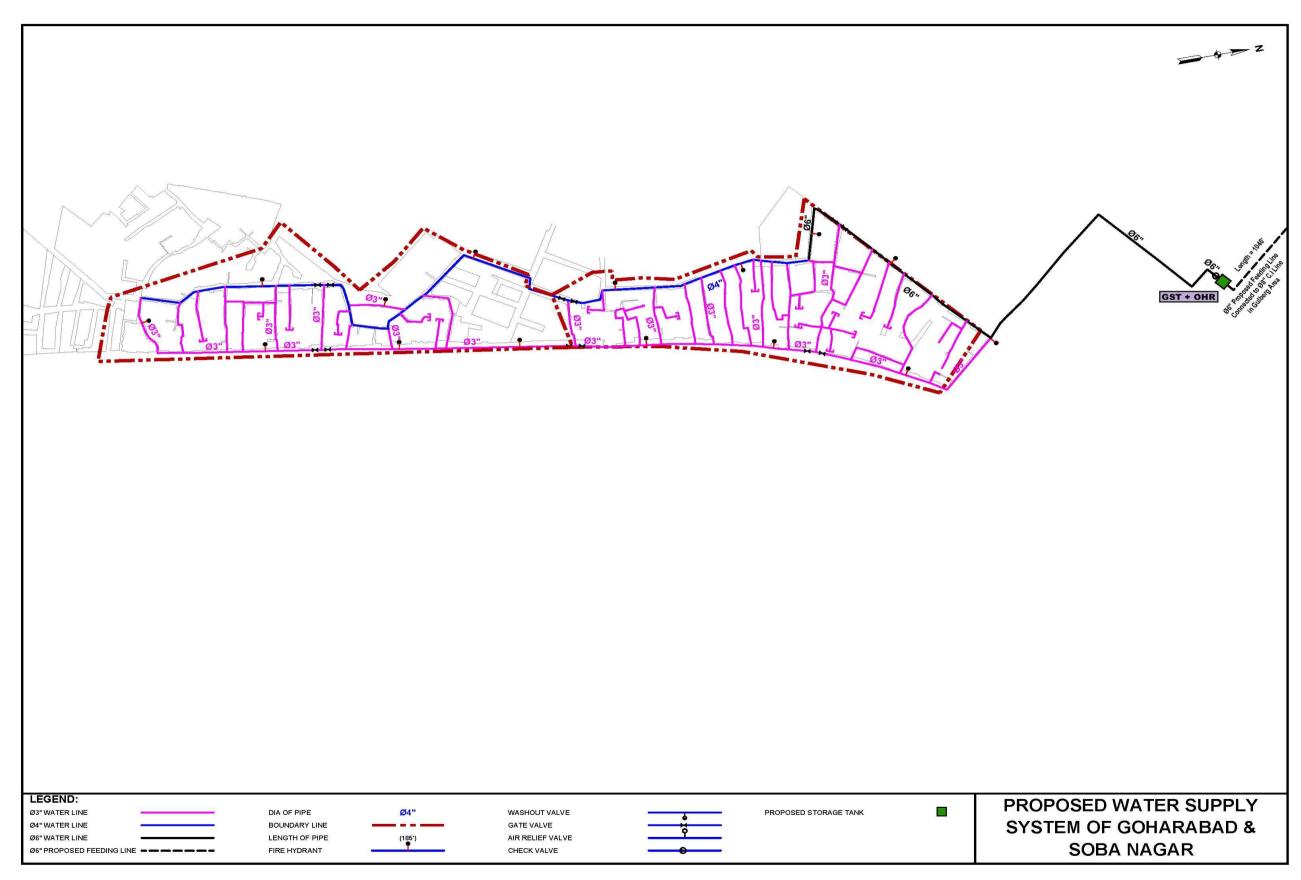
2: Layout Plan of Proposed Water Supply System in Sobanagar/ Goharabad
